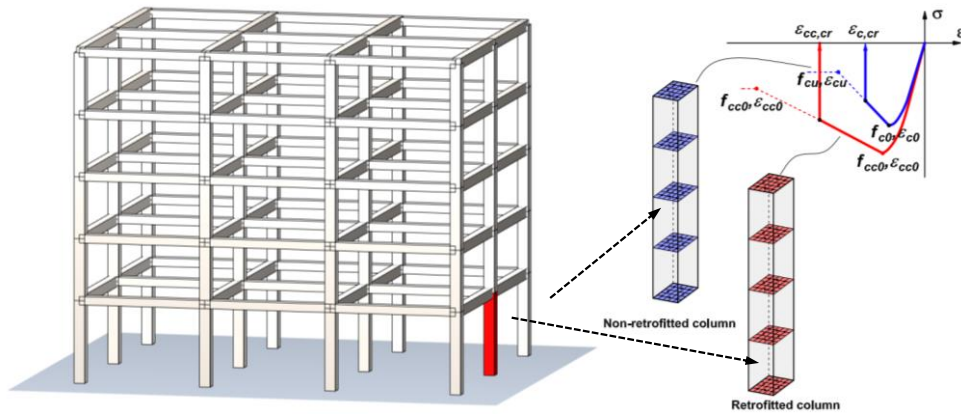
Definition of the frame fiber-section elements with and without steel-jacketing reinforcement.
